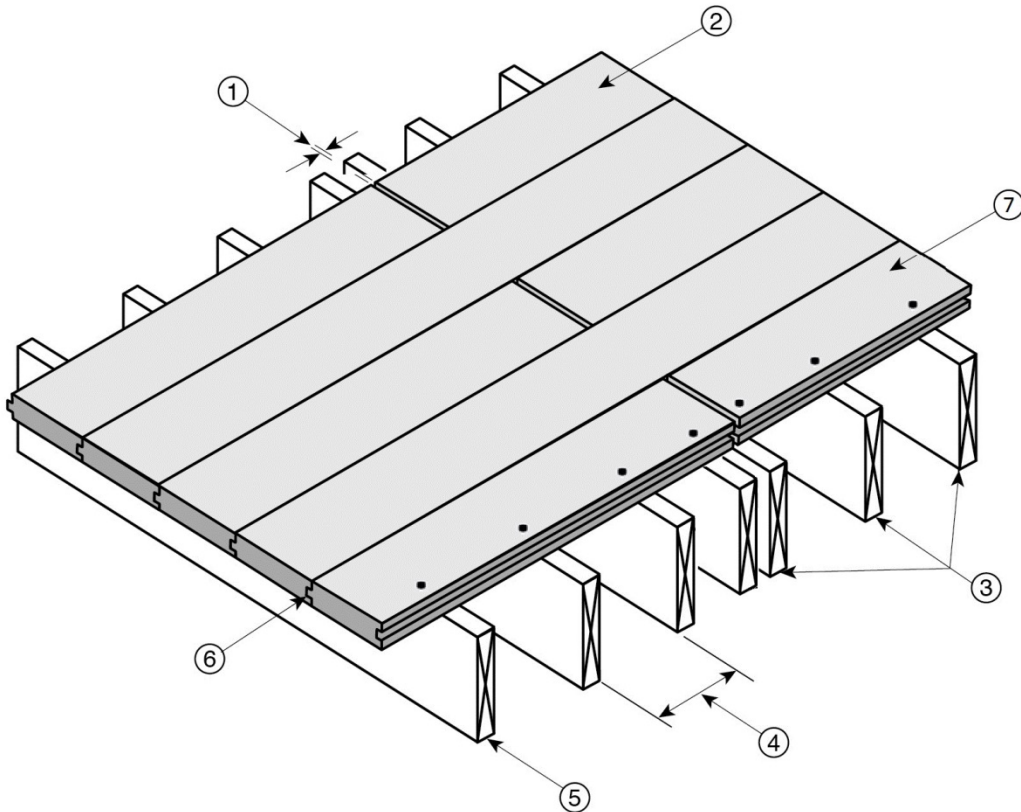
Installation details for “Inteplast Porch” and “Wolf Serenity Porch”, interlocking (tongue-and-groove) profile
